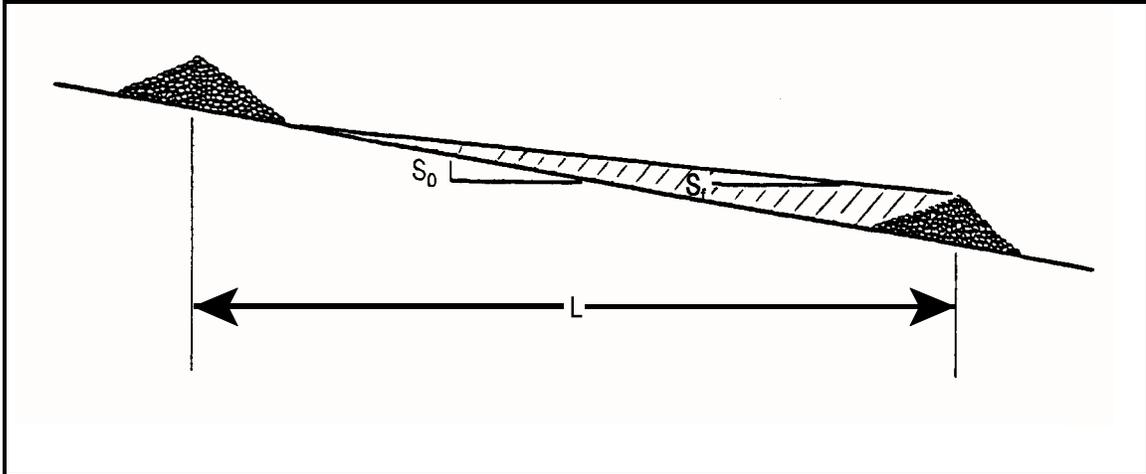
Spacing of Grade Control Structure (adapted from Mussetter, 1982)
